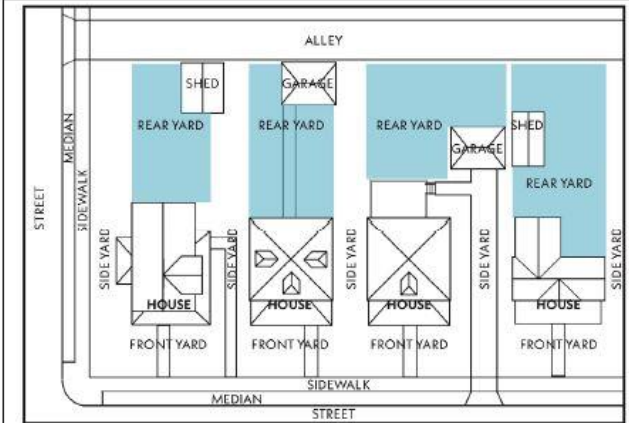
• The diagram above shows some example areas (marked in blue) that would be appropriate to place a new accessory structure. All plans must be reviewed prior to project initiation.
